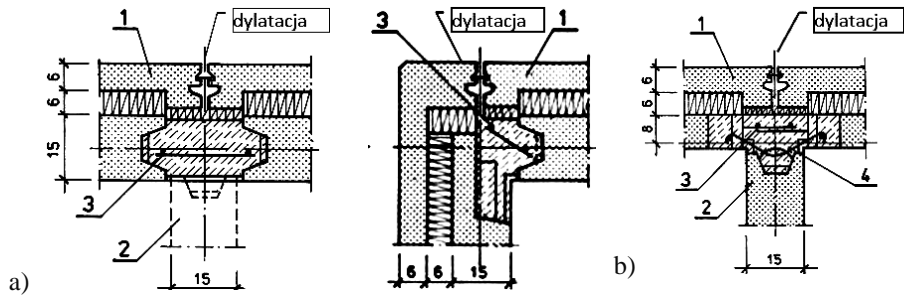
Connection of load-bearing layers in vertical joints and dilatation for texture layer: a) ZWS+ZWS joints in load-bearing walls b) ZWO+W+ZWO joint of load-bearing wall W with curtain walls ZWO; 1 - texture layer, 2 - load-bearing wall W, 3 - vertical reinforcement mesh, 4 - cramps
